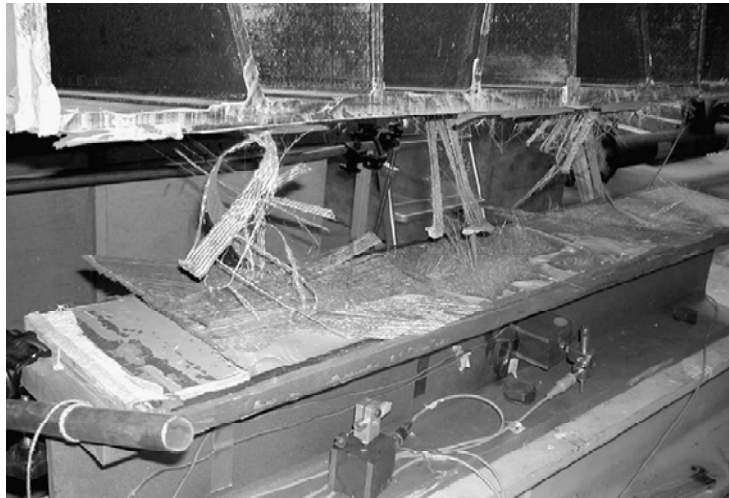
Fibre-tear failure of the outer mat layers of the adhesively bonded FRP deck to steel girders subjected to tensile forces(Keller & Schollmayer, 2009)
